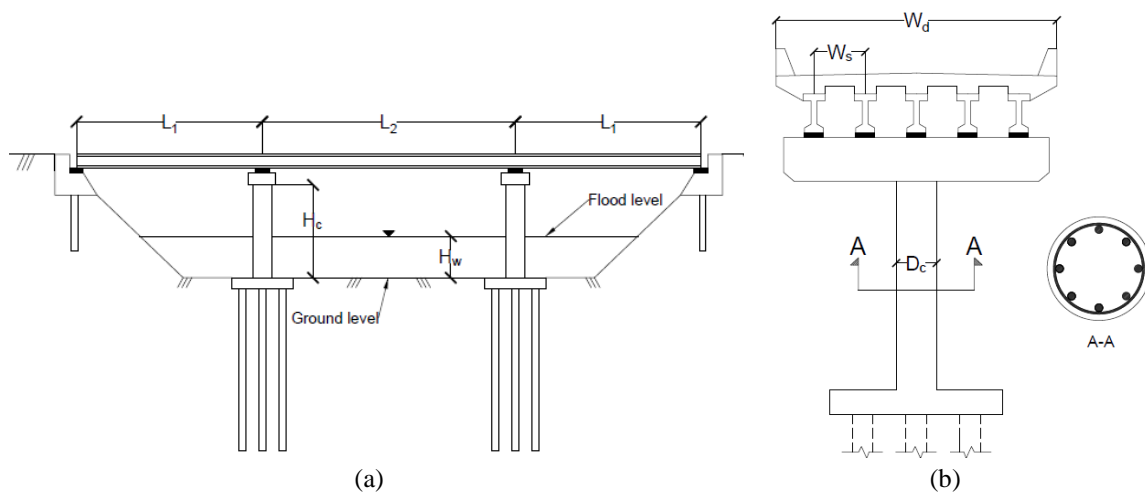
(a) Longitudinal and (b) transverse views of MSC concrete girder bridge
